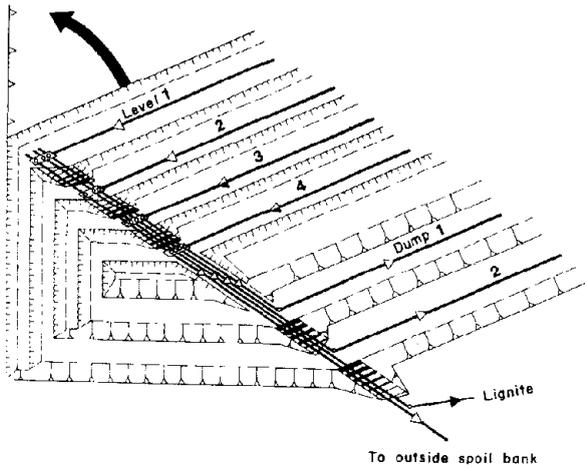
Diagonal belt conveyor between mining site and dump site.
